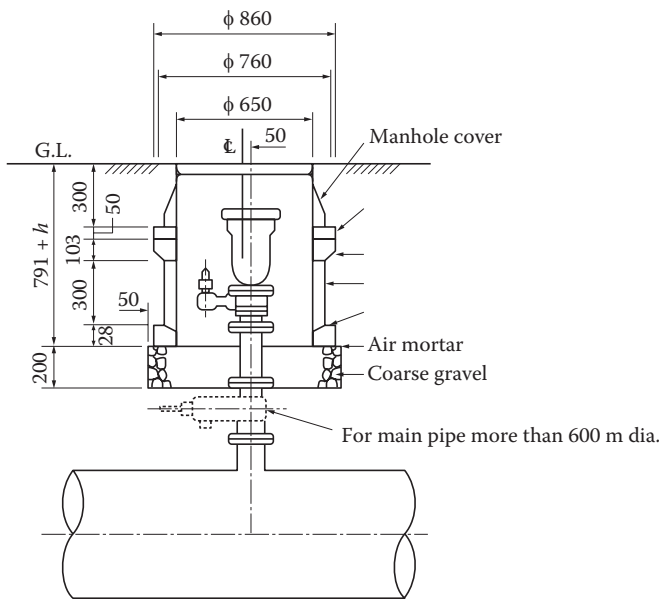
Single-mouth air valve (Osaka city) (unit: mm).
